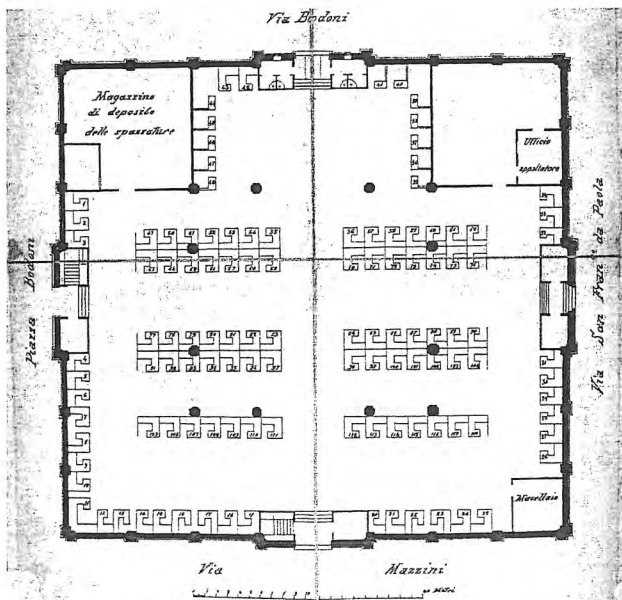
Plan of the ground floor of the market, after 1893, (ASCT, Collezione Q XIV, n. 5, lotto VIII)
